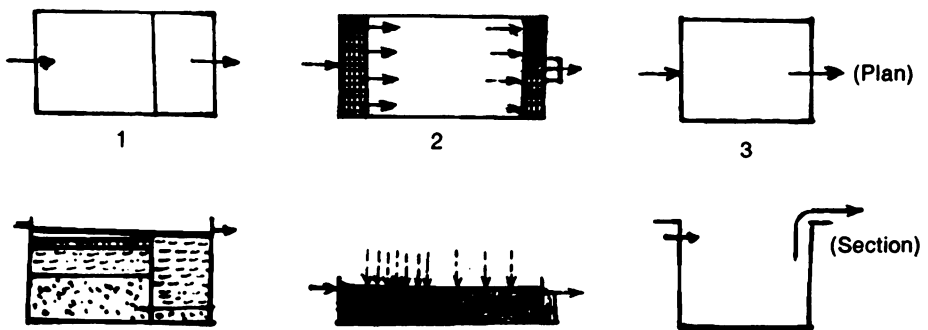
Schematic plant layout for wastewater treatment: 1. Septic tank, 2. Reed bed, 3. Collection or polishing tank.
